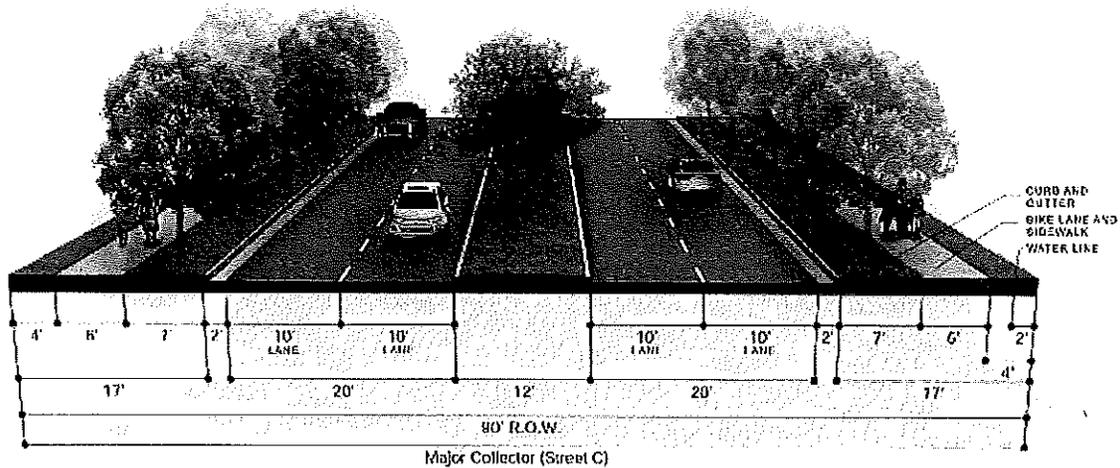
Proposed Street C Major Collector Adjacent to School 90' ROW
